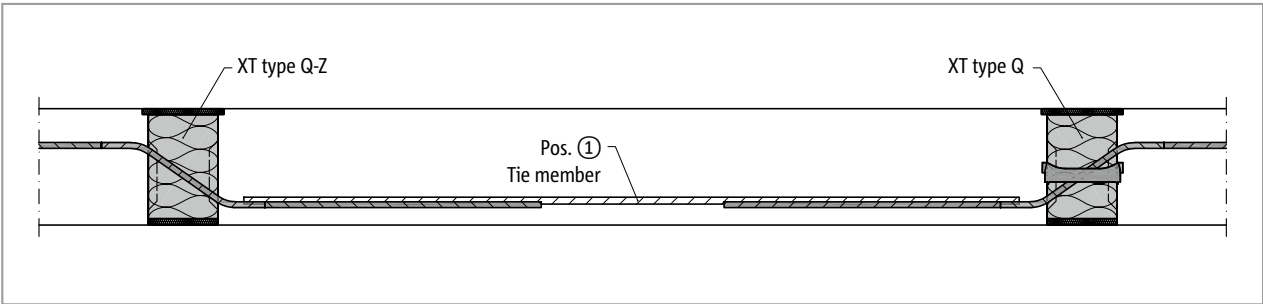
Schöck Isokorb® XT type Q-Z-V5 to Q-Z-V11, Q-V5 to Q-V11: Section A-A; one direction spanned reinforced concrete slab
